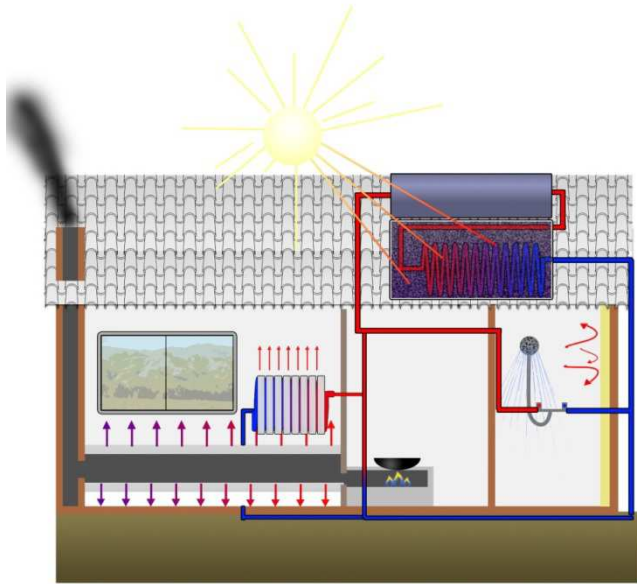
Traditional home with elevated Kang, improved windows, building insulation, domestic hot water system and stove based radiative heating
